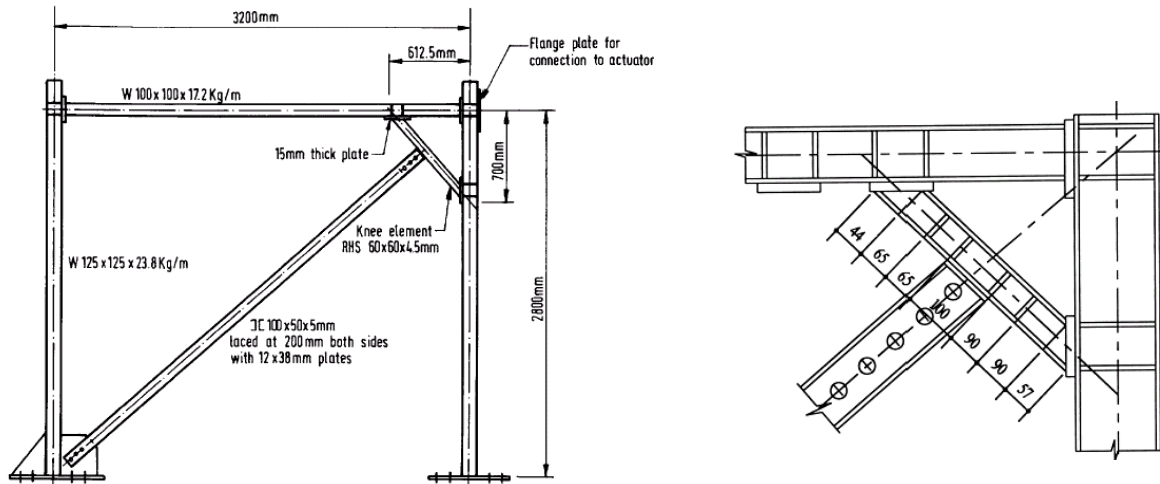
KBFs: layout for a single story frame (left) and knee detail (right) (after Sam *et al.*, 1995).
